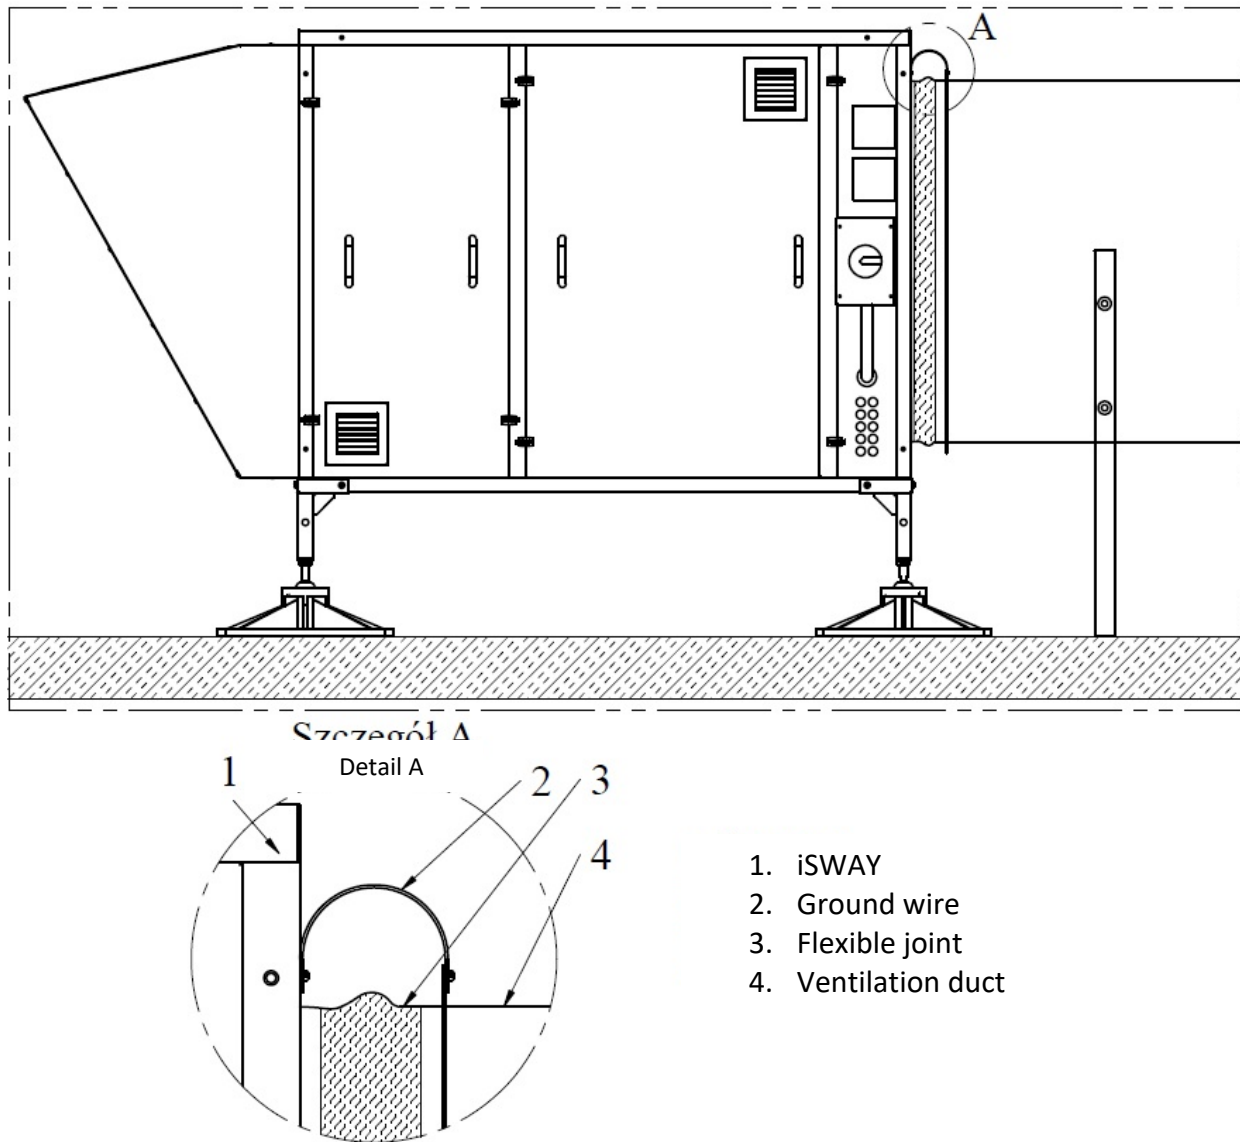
Connection of ventilation ducts, connection of flexible ground wire.
